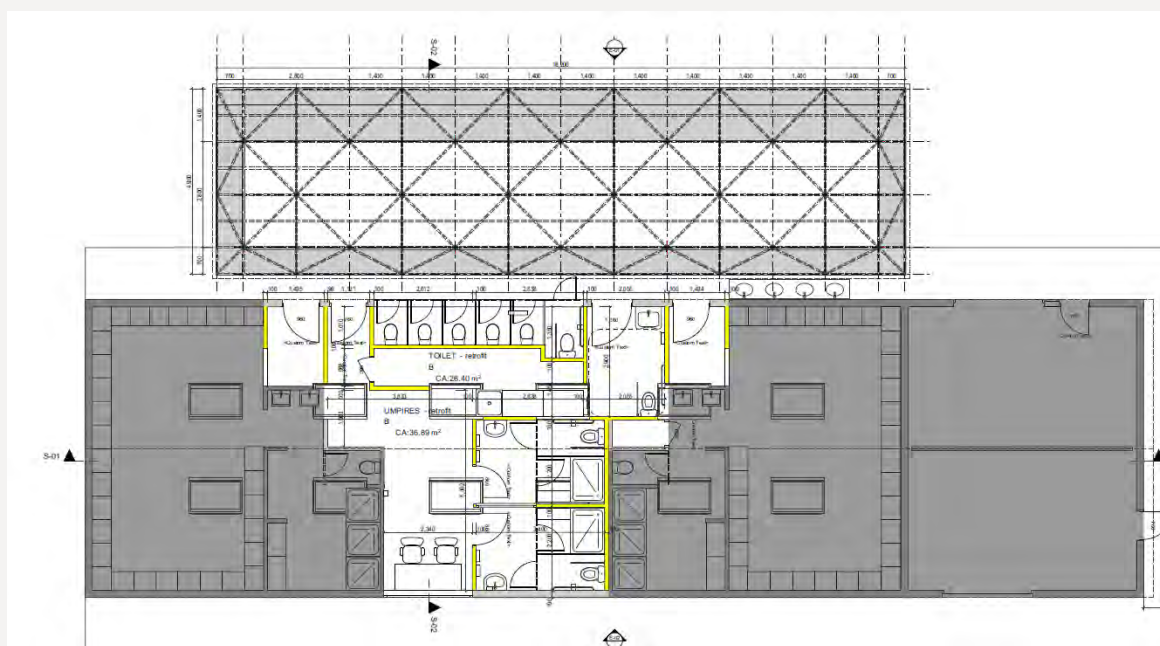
Proposed retrofitted floor plan (existing amenities building)
